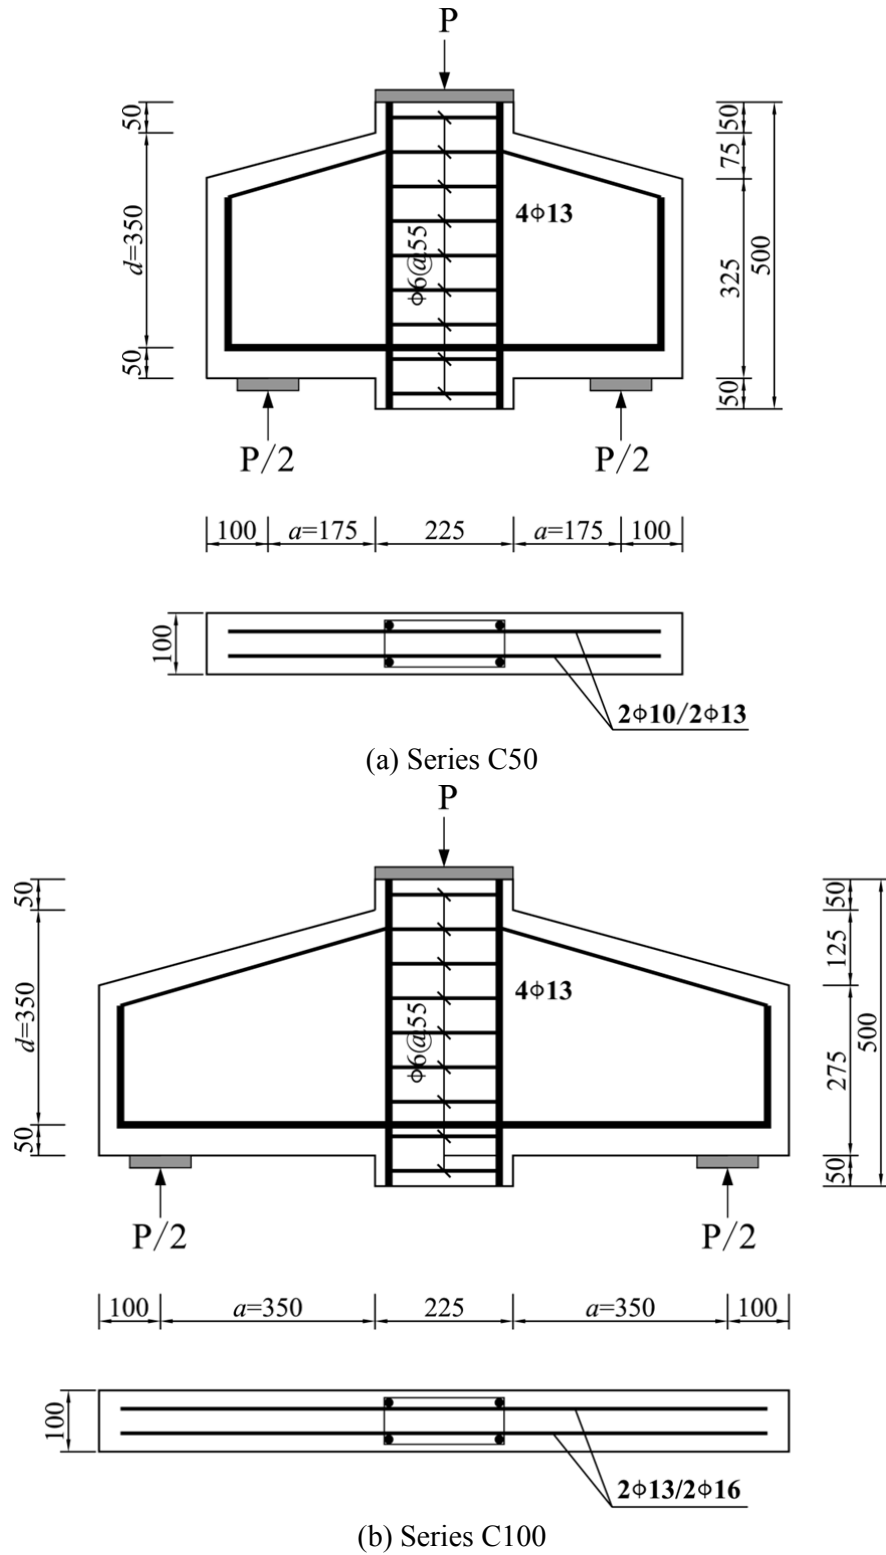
Size and reinforcement details of test specimens (all dimensions in mm)
